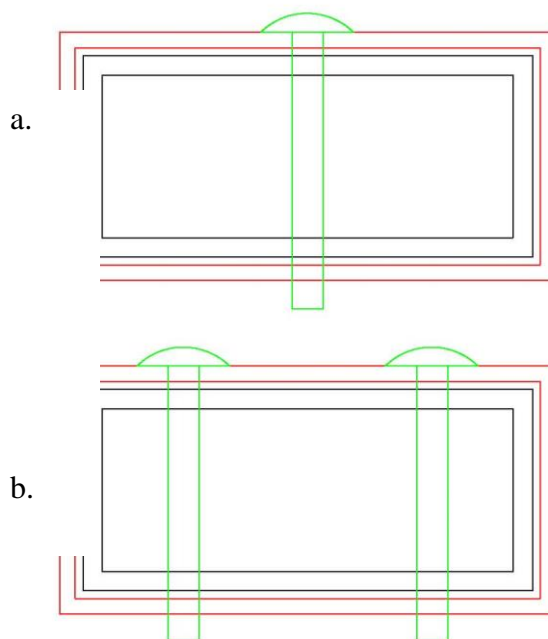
Top Tube and Inner Splice Tube with Bolt Configurations, Option 1
